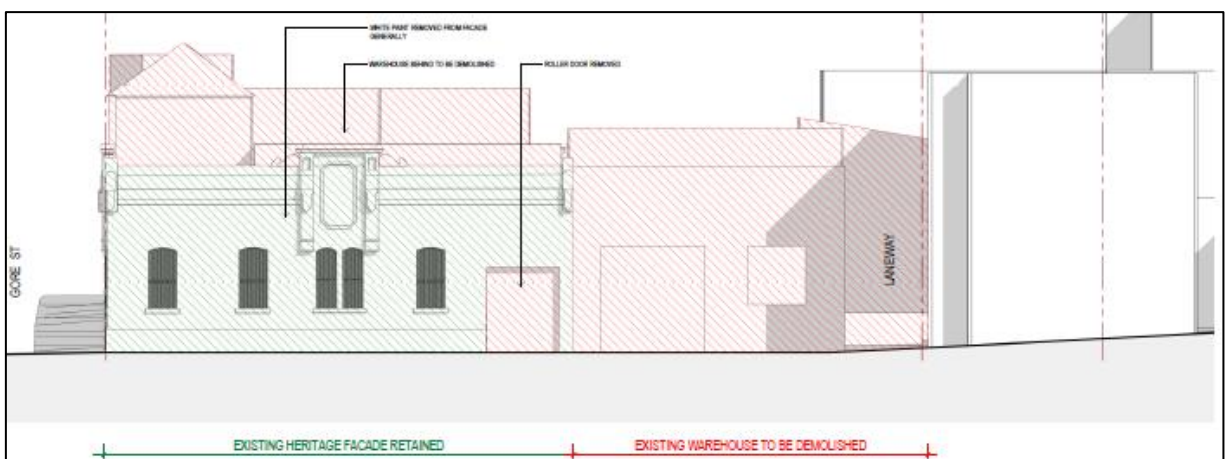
Extent of demolition along the Argyle Street Façade (SJB Architects March 2020)
